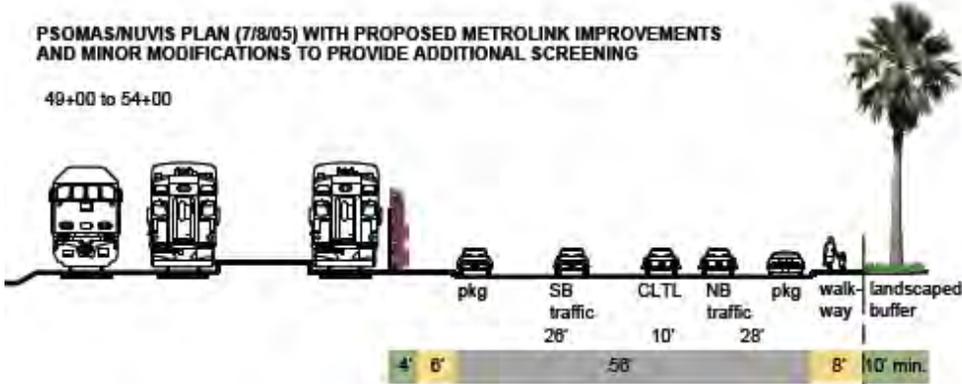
A Camino Capistrano Cross Sections—Looking North
